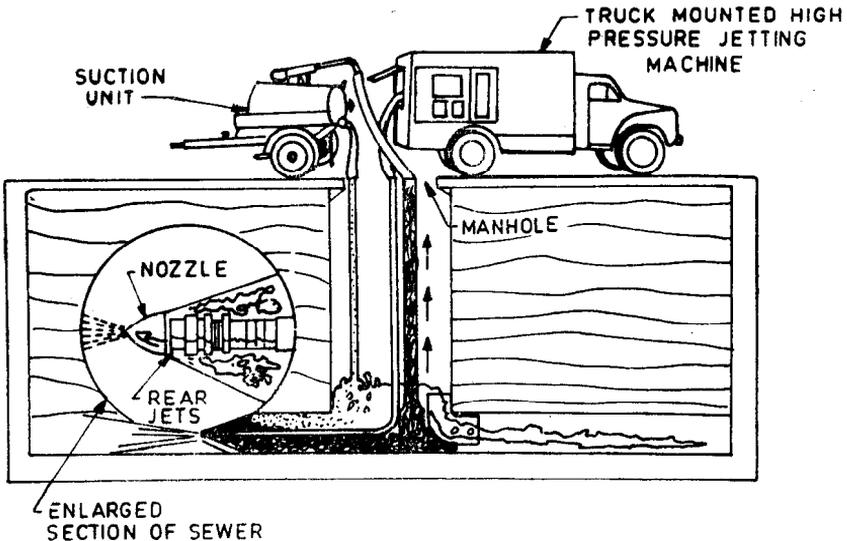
TYPICAL SKETCH OF WORKING OF HIGH PRESSURE JETTING MACHINE
